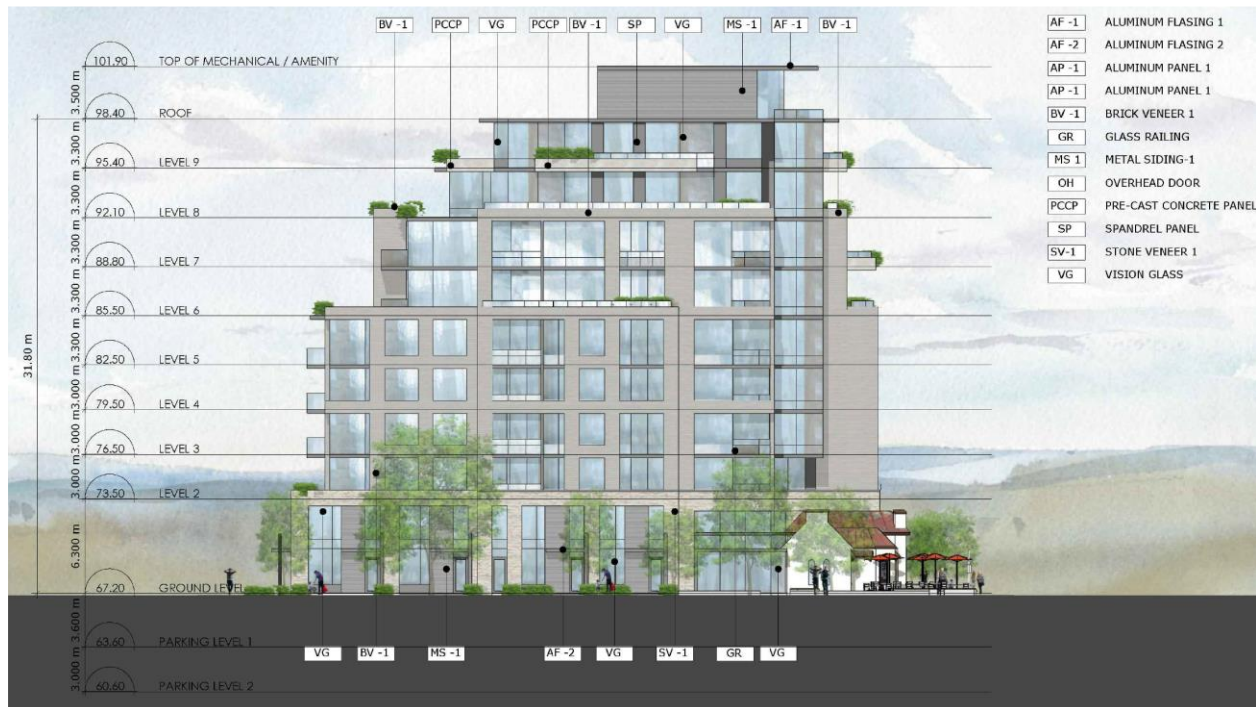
West Elevation illustrating the stepping down of the building towards the residences on Island Park.
